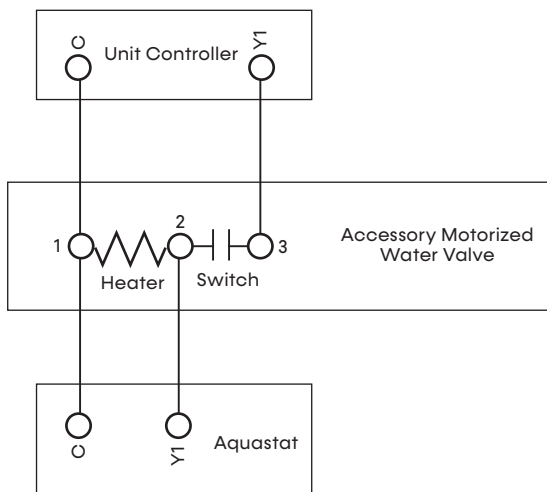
Accessory Motorized Water Valve - Typical Wiring Example #2
